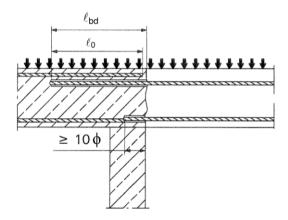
End anchoring of slabs or beams (e.g. designed as simply supported)
